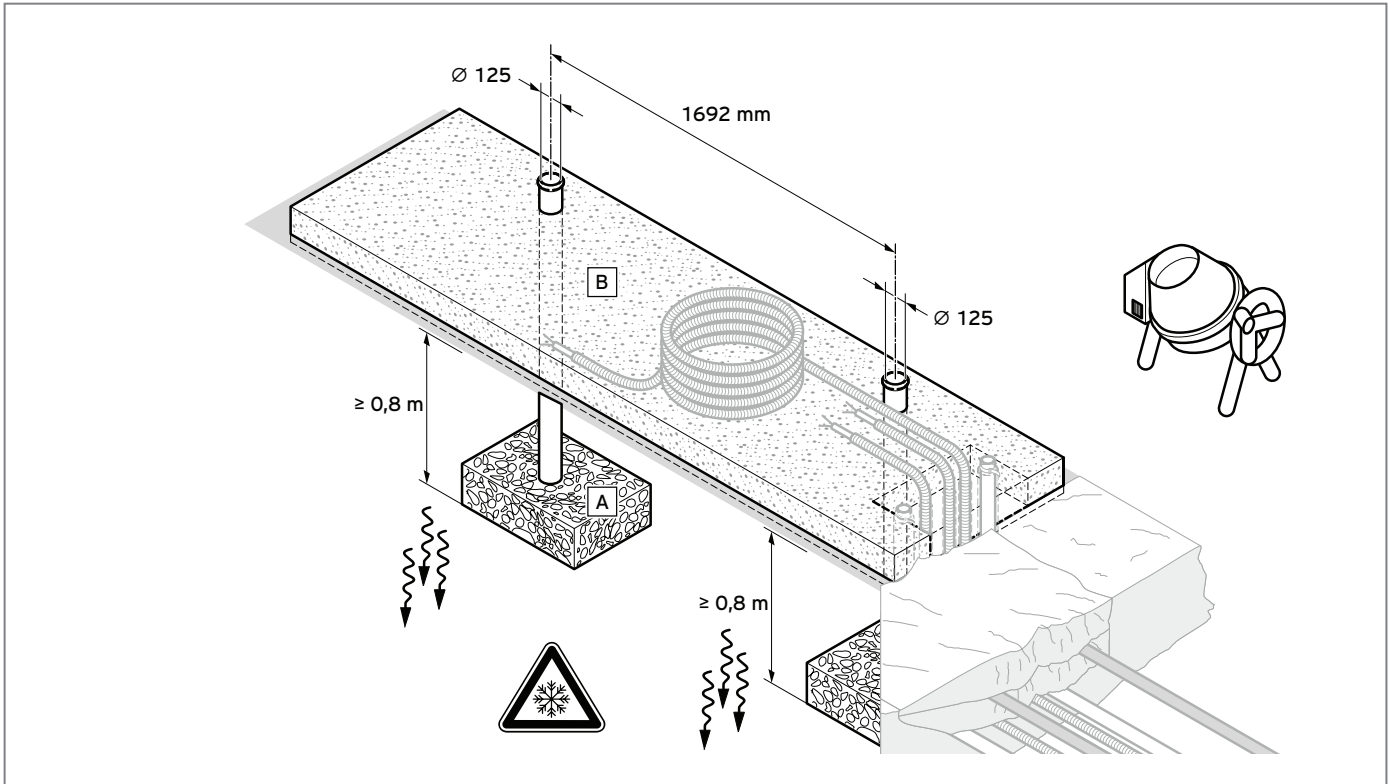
Foundation plan for two aroCOLLECT outdoor units
